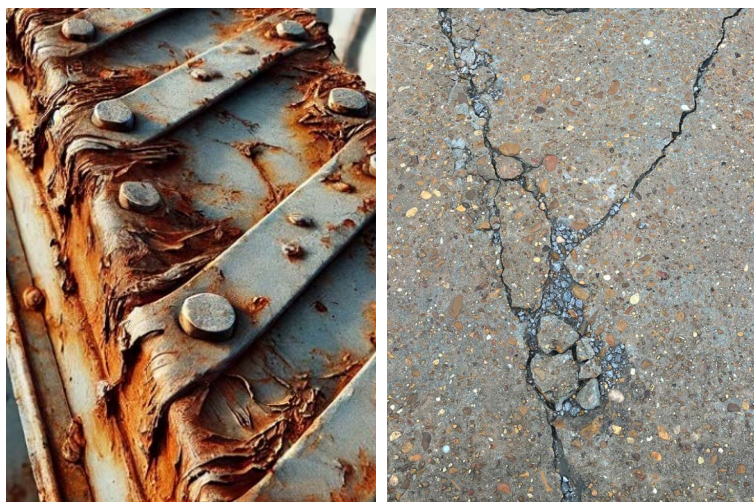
Corrosion in a steel structure and flaking and cracking in concrete.
